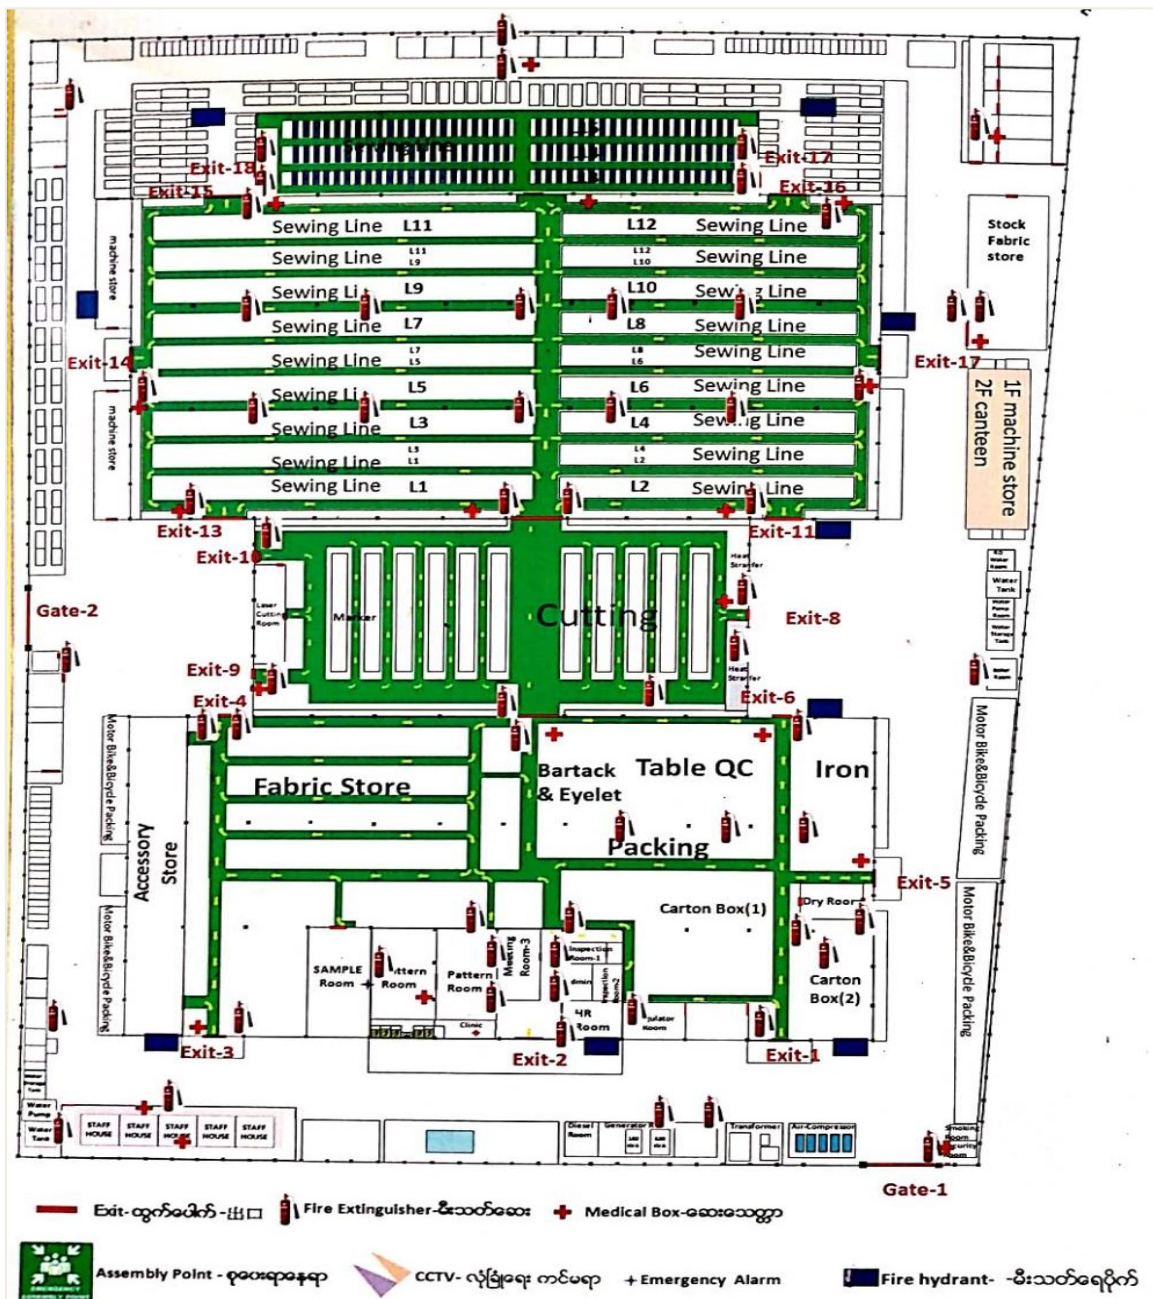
Layout Plan Map of Hakers Enterprise Factory
